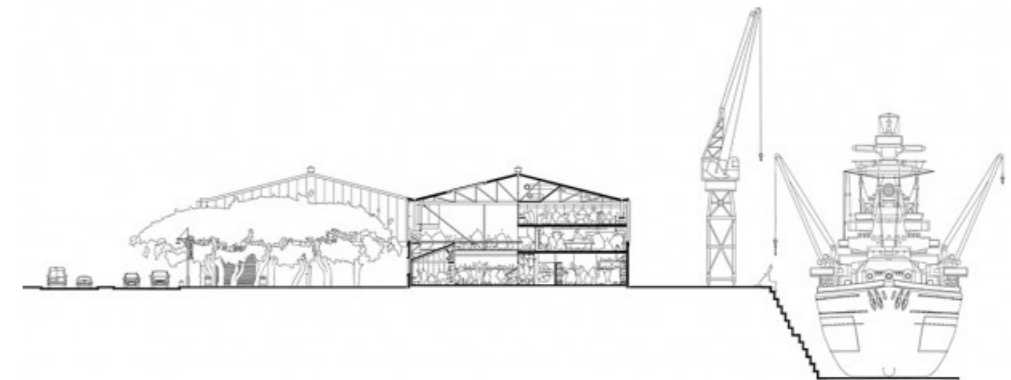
Cross section showing Watershed and adjacent drydock (Wolff Architects, 2014)
